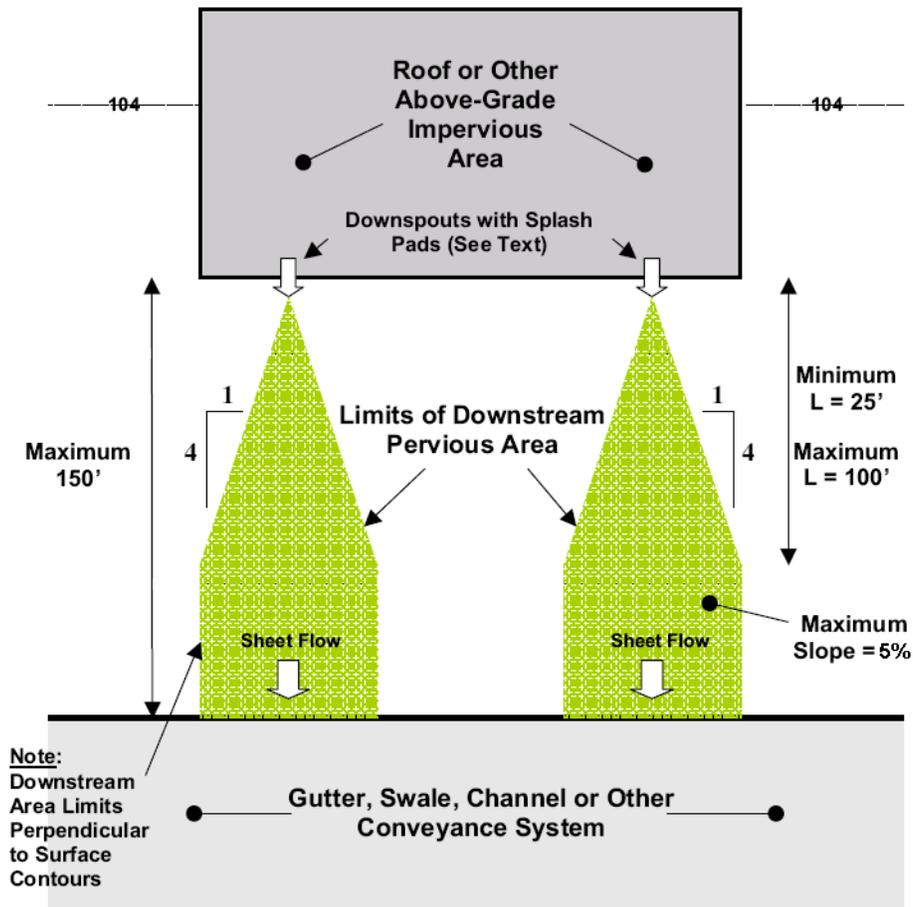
Standards for disconnecting impervious surface via downspouts. Source: New Jersey Department of Environmental Protection, 2004.
